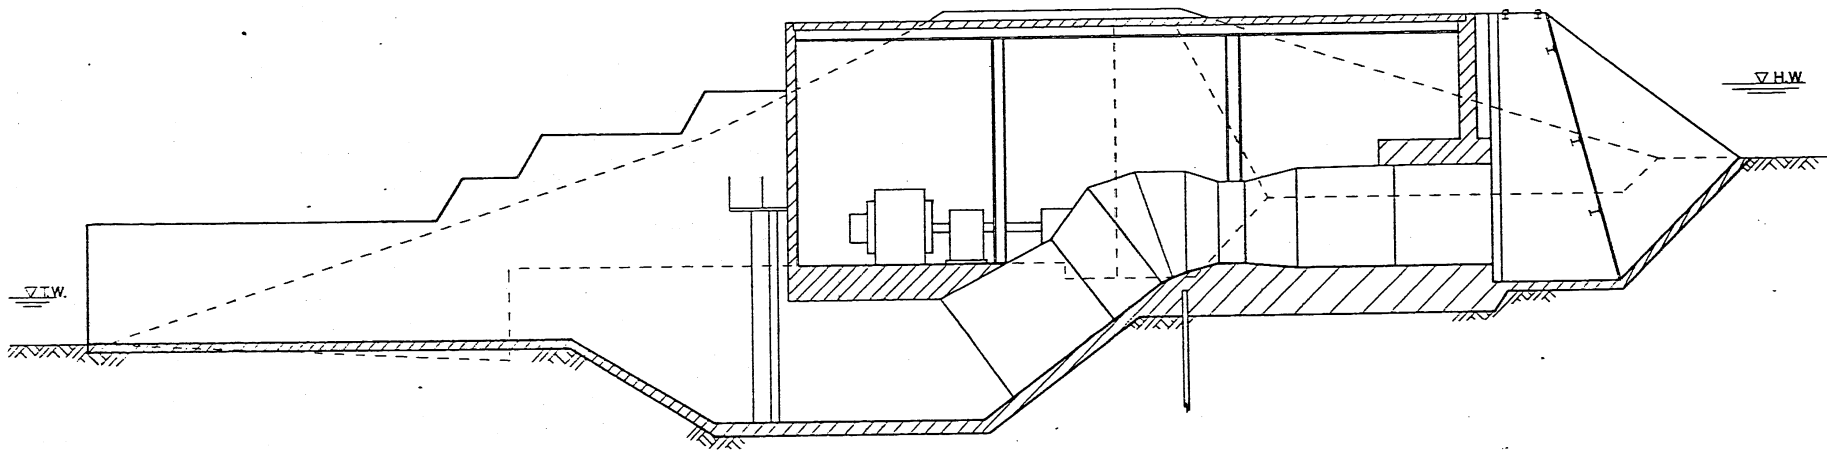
Cross Section Through Powerhouse Showing Typical Arrangement of a Horizontal Tubular Unit Set in the Earth Embankment. Dashed Lines Indicate Existing Embankment.
